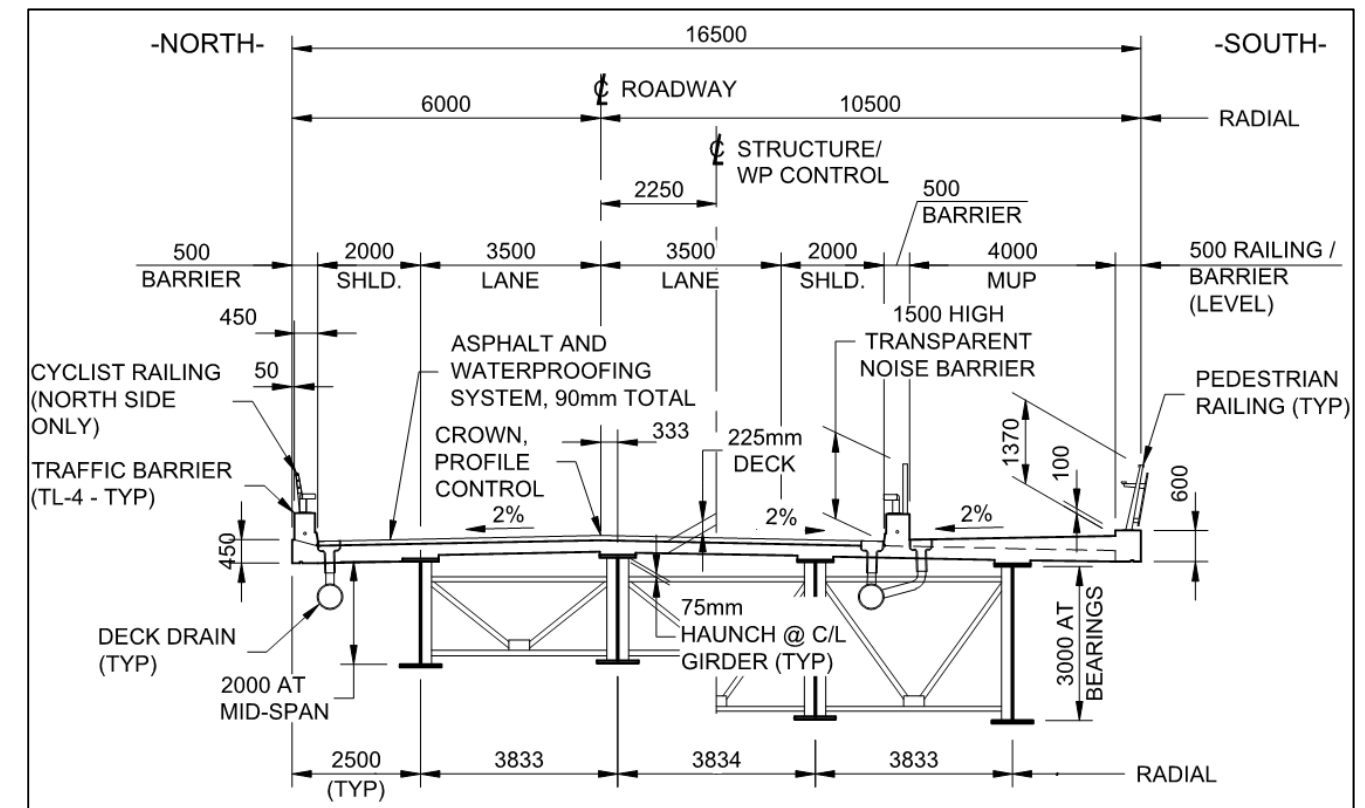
Cross-Section of Bridge East of the Arch with Noise Barrier
